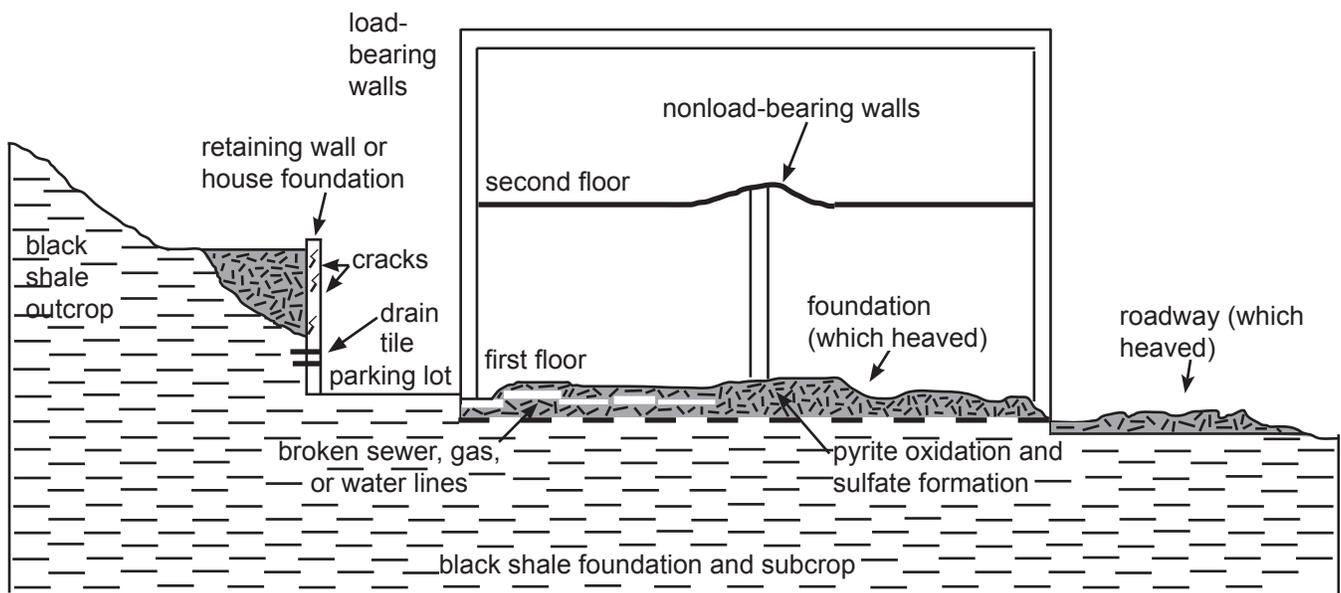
Schematic diagram of Chattanooga Shale outcrop, demonstrating pyrite oxidation and sulfate formation. Floors heave because sulfate forms and puts pressure on load-bearing walls. Roads, nonload-bearing walls, and retaining walls could be affected by continued pyrite oxidation and sulfate formation.
